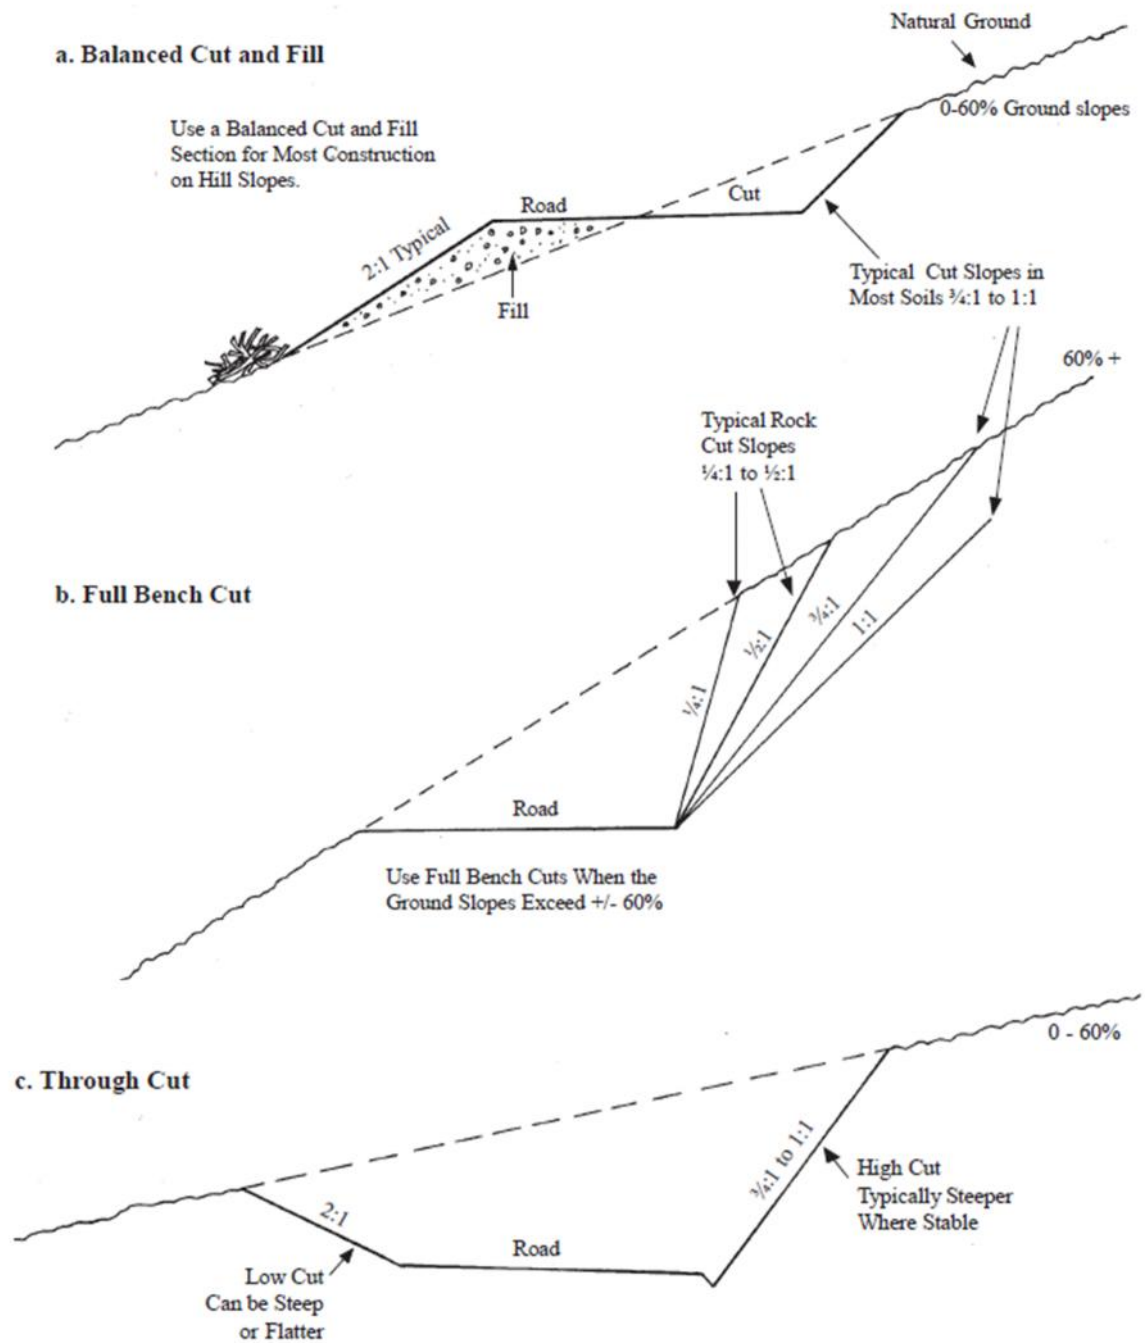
View of different types of cut failure (a) balance cut and fill, (b) full bench cut, (c) through cut
